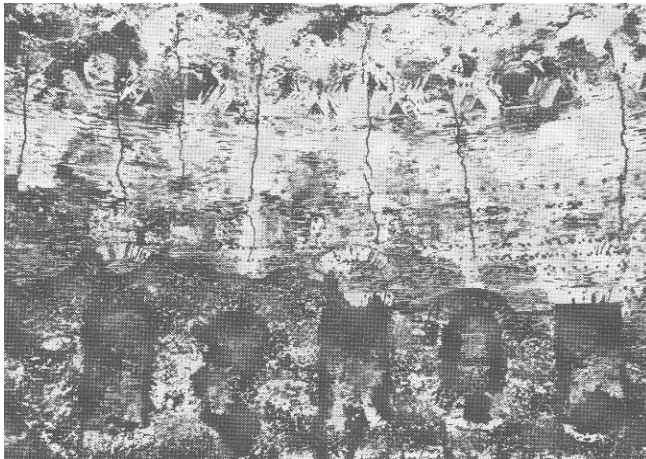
Radial cracks in the old dome masonry structure (UNDP, Vol. 6)
